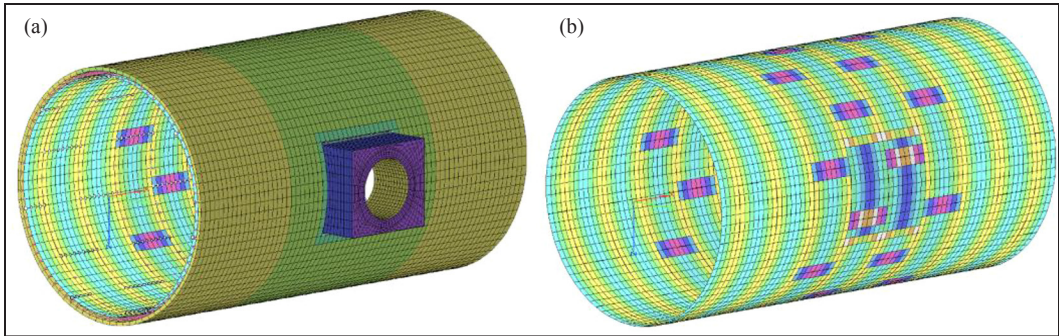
Model of adit connections: (a) adit collar; (b) isometric view of segmental lining ring
